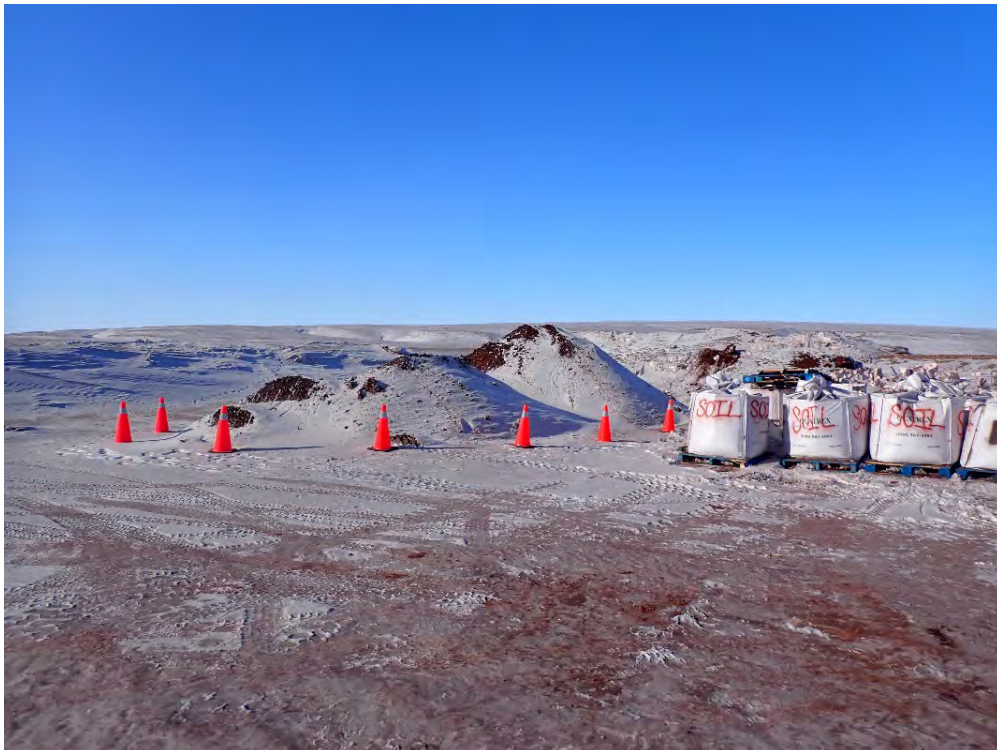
Mine Site Landfarm Facility Cell 1 Temporary Staging – February 2023
